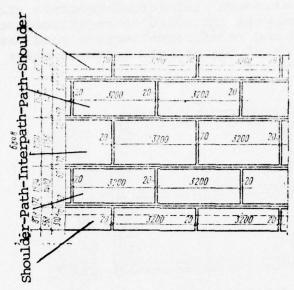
Laying of pre-fab slabs on detached tramway bedding
